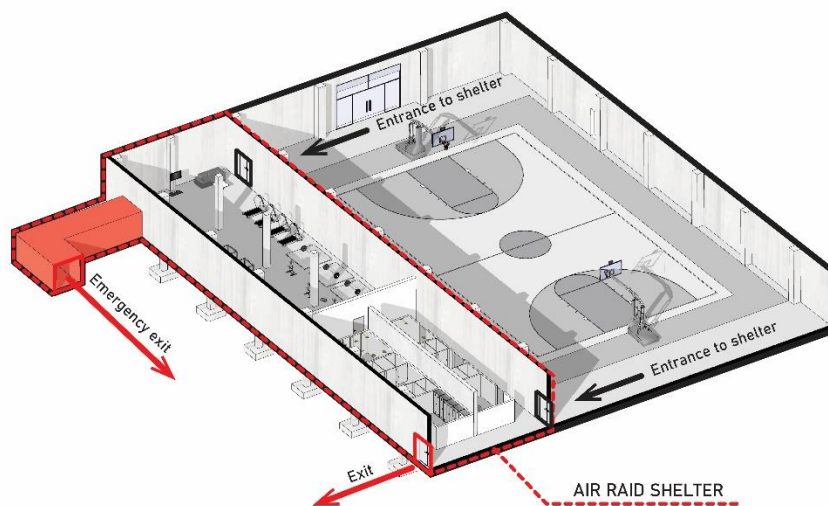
Scheme of the installation of the shelter near the gymnasium
